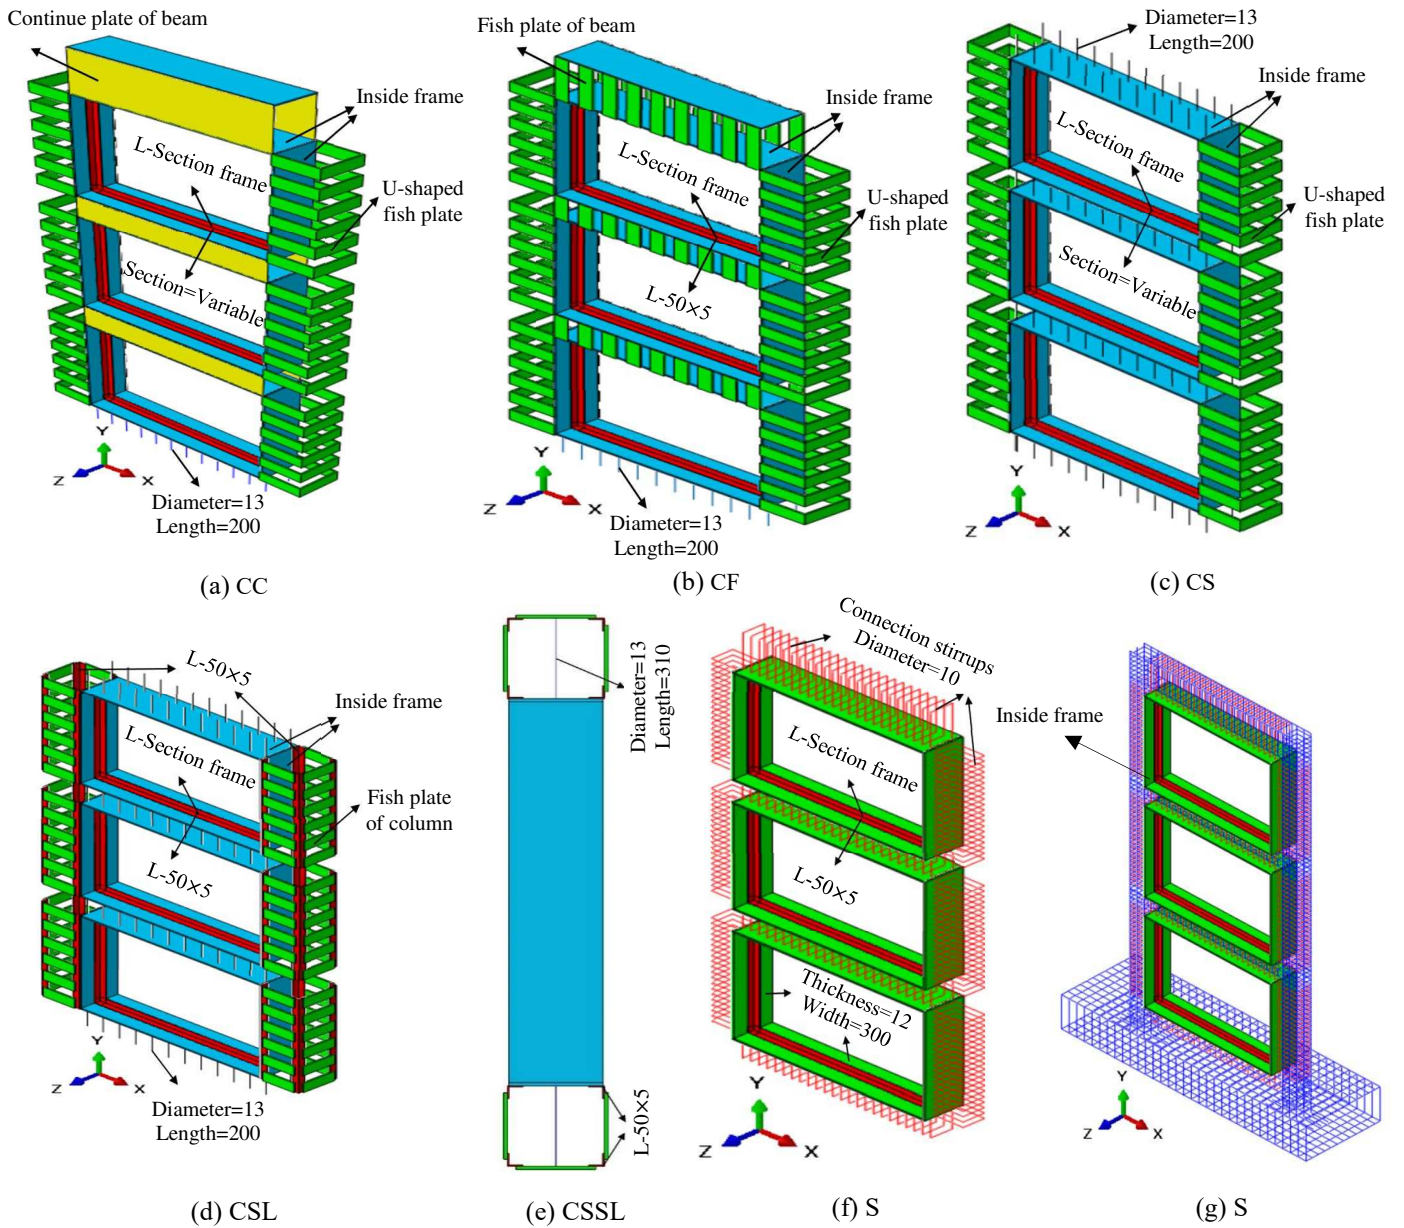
Details of the different types of connections, (a) and (b) are type 1, (c) is type 2, (d) and (e) are type 3 and (f) and (g) are type 4, dimensions are in mm.
